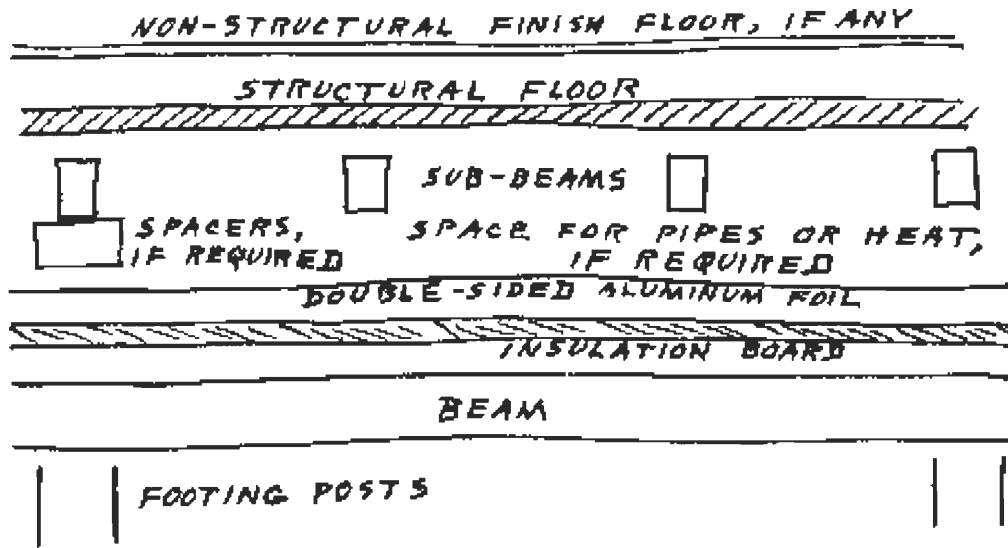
Cross-section of a floor illustrating the various layers for support and insulation. (Roberts, 135)
